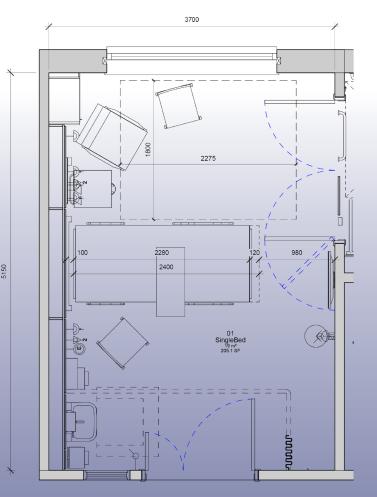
Nested Single Bedroom Repeatable Room Arrangement (not to scale)
